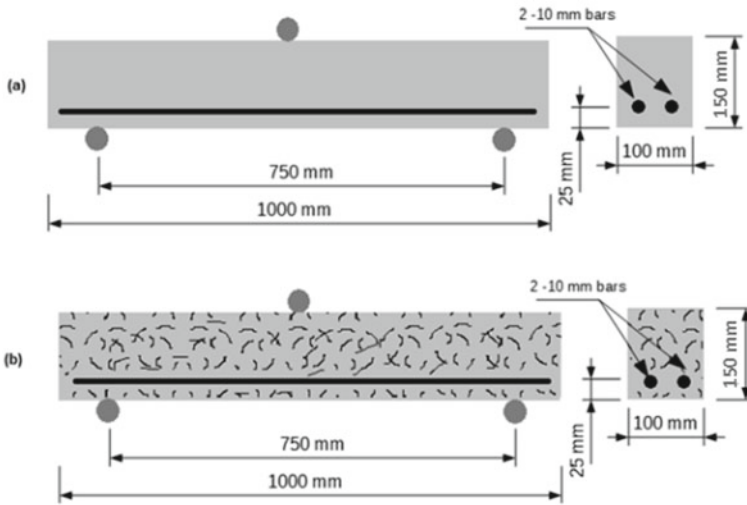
Details of beam specimens: a RC beam and b steel fiber RC beam
